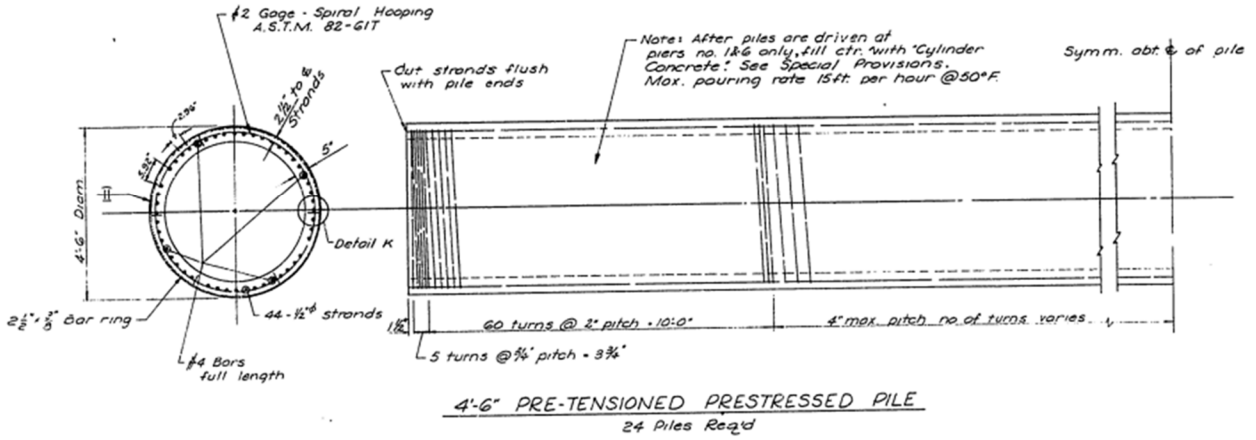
Alternative Below Grade and Footing Details (Galer-Lakeview)
